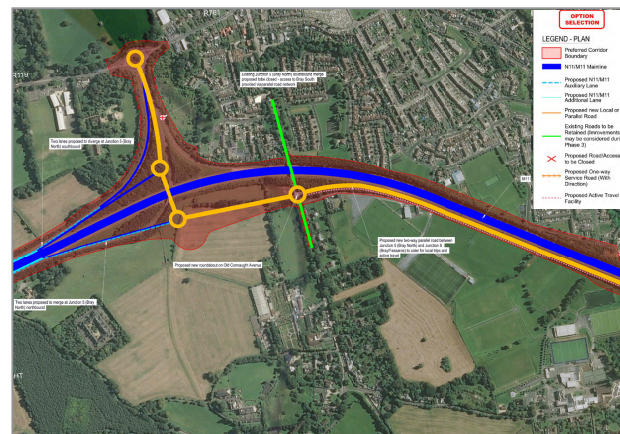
N11/M11 Junction 4 to Junction 14 Improvement Scheme Preferred Corridor and Road Improvement Option Plan Layout
